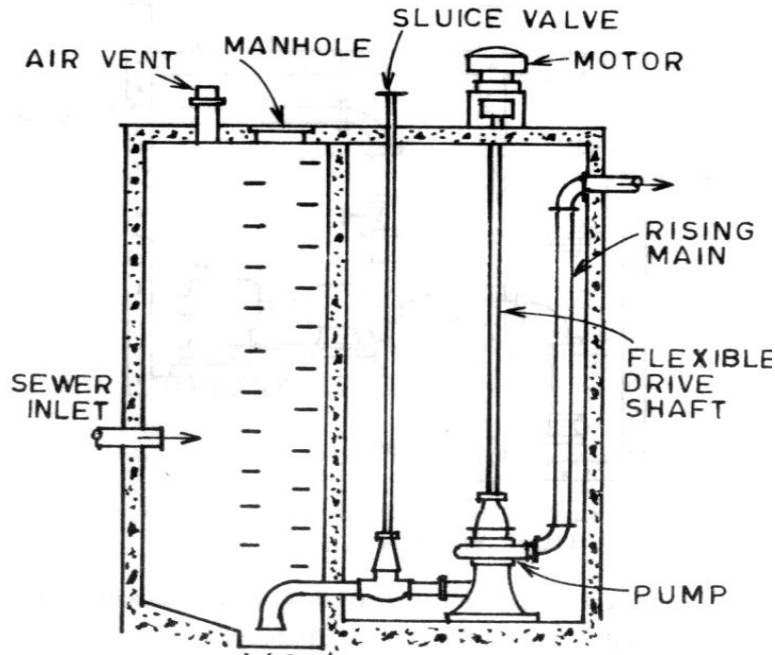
Centrifugal pump with vertical shaft installed in a dry well or dry pit
